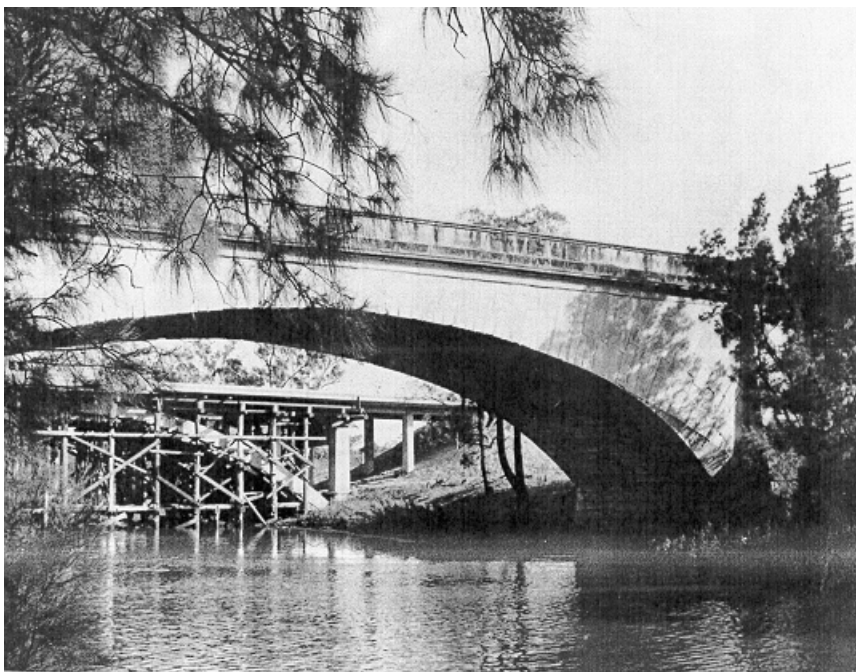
View of Lansdowne Bridge looking south in 1957. The new bridge for westbound traffic is under construction in the background.
